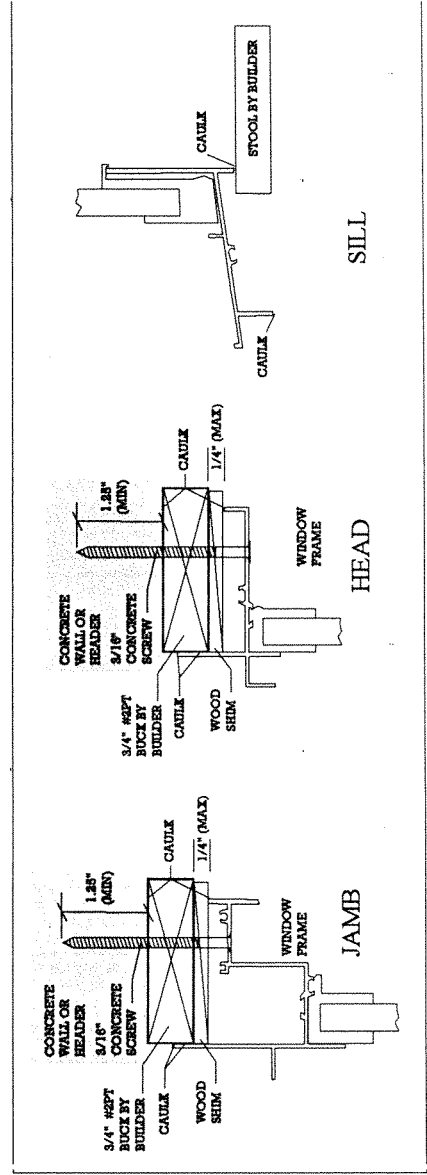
TYPICAL FASTENING OF WINDOW FRAME TO CONCRETE BLOCK
